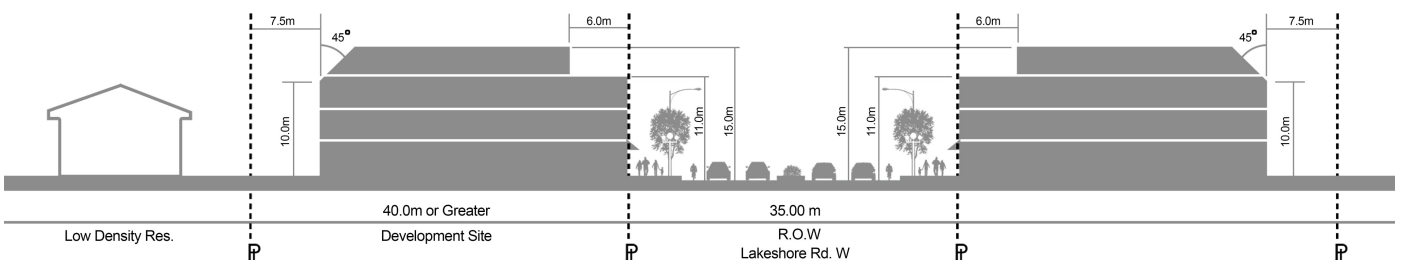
Cross Section 2 Outer Village Core Area
